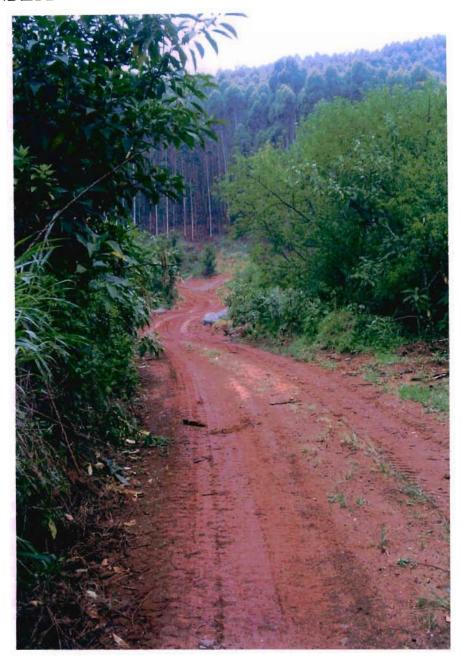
Ntonjaneni Forestry Road providing access to the timber
